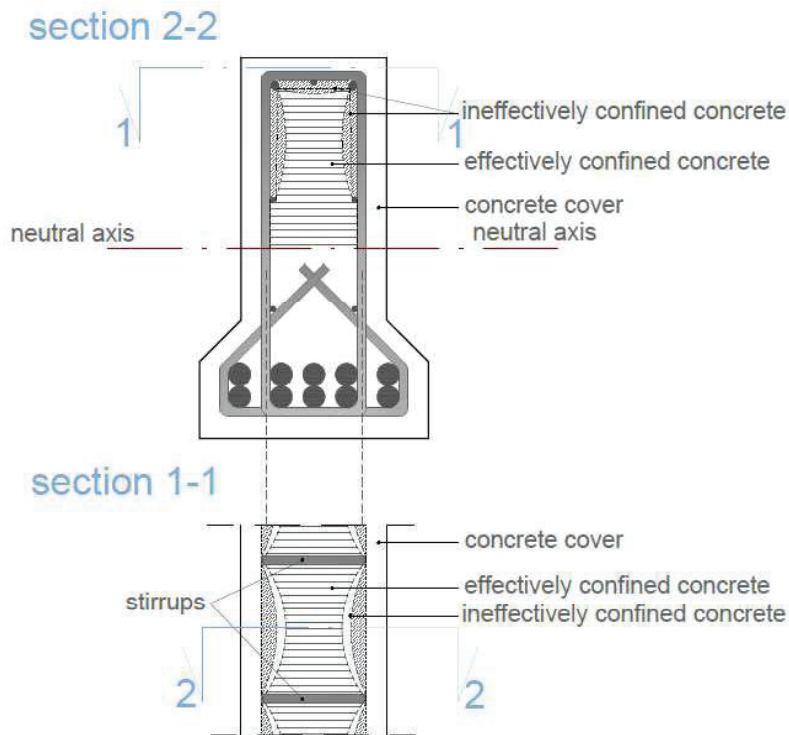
Effectively and ineffectively confined areas in beams. Top: Cross section. Bottom: Longitudinal section.
